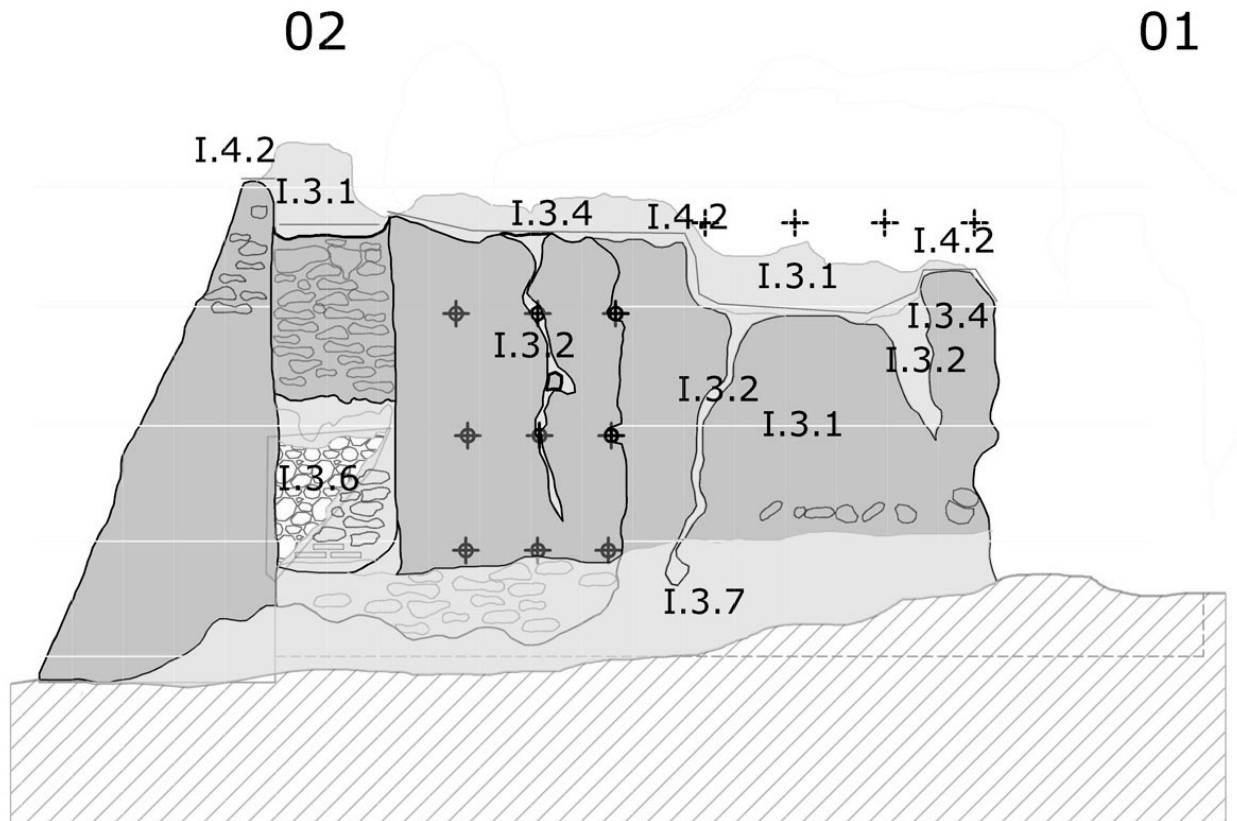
North elevation of the lower tower proposed intervention. Project 2018. (Own elaboration).
